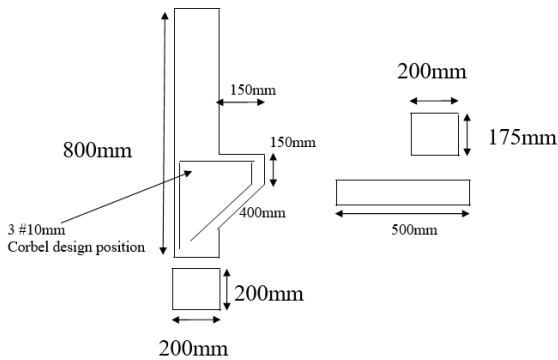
Type2 Precast Beam-Column Junction with dimensions
